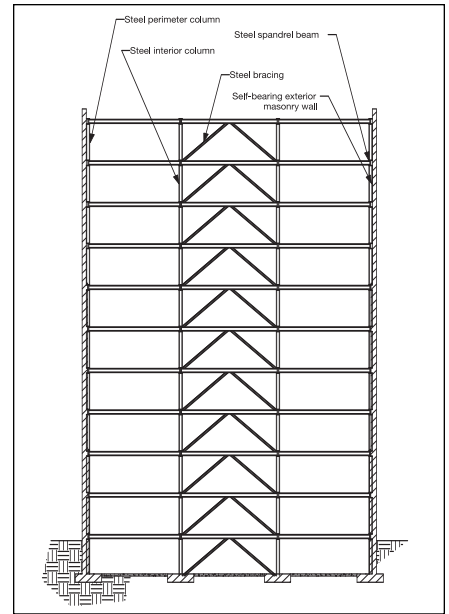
Schematic cross-section of frame-braced cage building. Drawing by the author.
